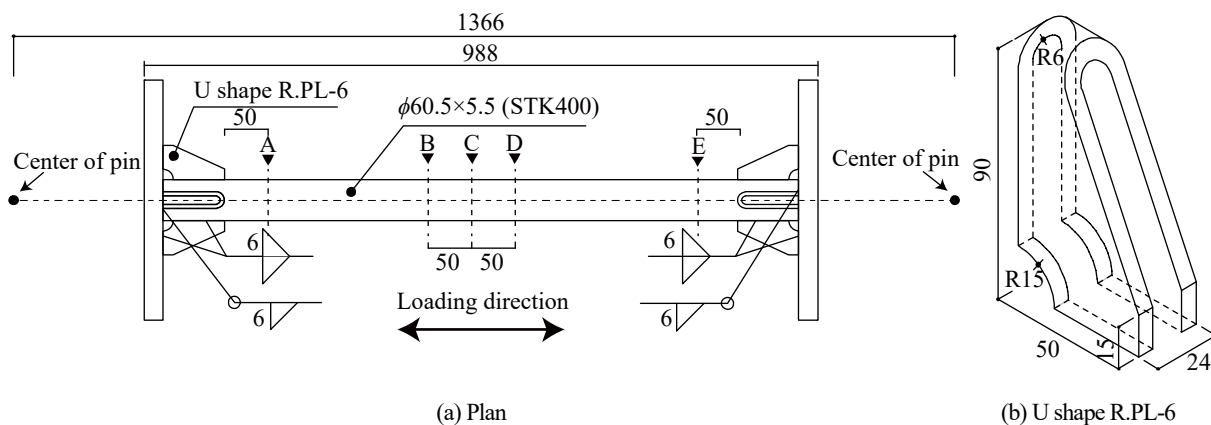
Specimen drawing including strain gauge places (C1412U, unit: mm)
